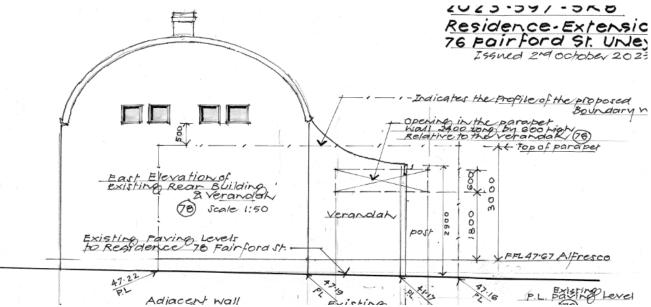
Cross section of the wall along the western (side) boundary in relation the dwelling on the adjoining allotment (78 Fairford Street)
